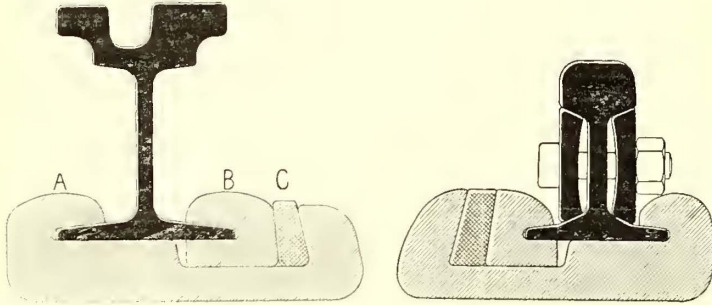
SECTIONS OF BOLTLESS RAIL JOINT
